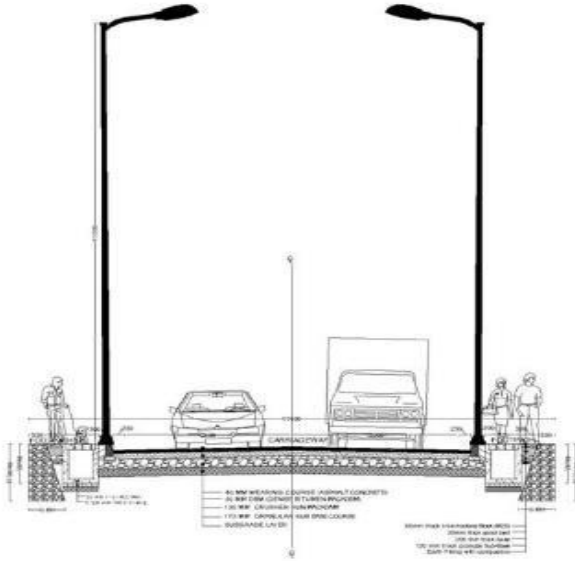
Typical Cross section for 11 m road (section Type B)
